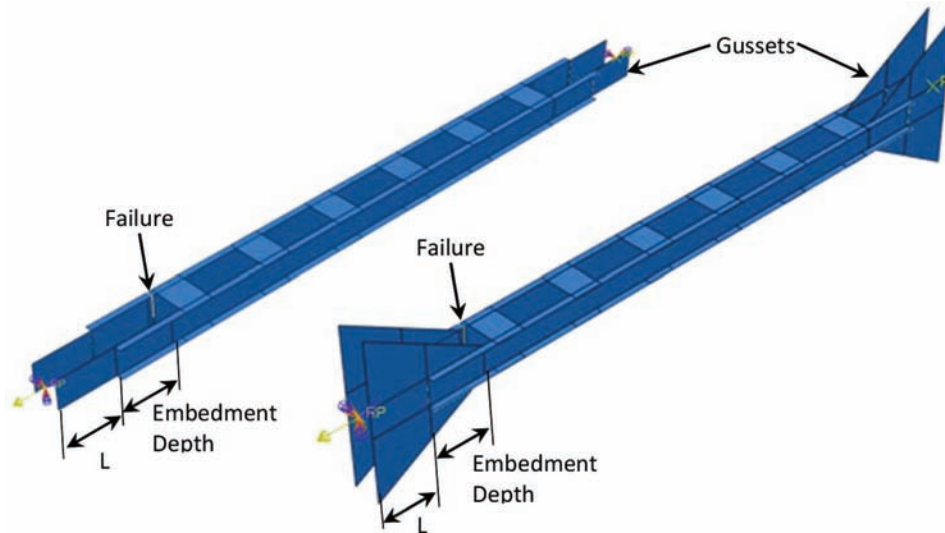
Example of FEMs used to study gusset connection parameters (left) rectangular gusset, (right) Whitmore gusset.
